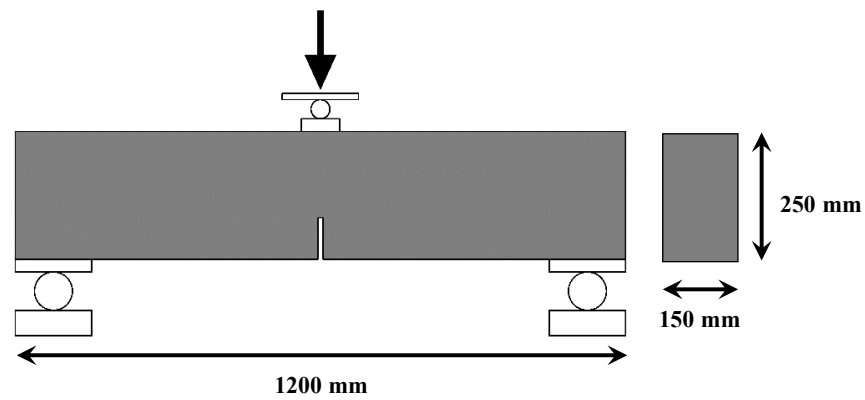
Geometry of the non-reinforced concrete beam specimens. The notch depth is 82 mm.
